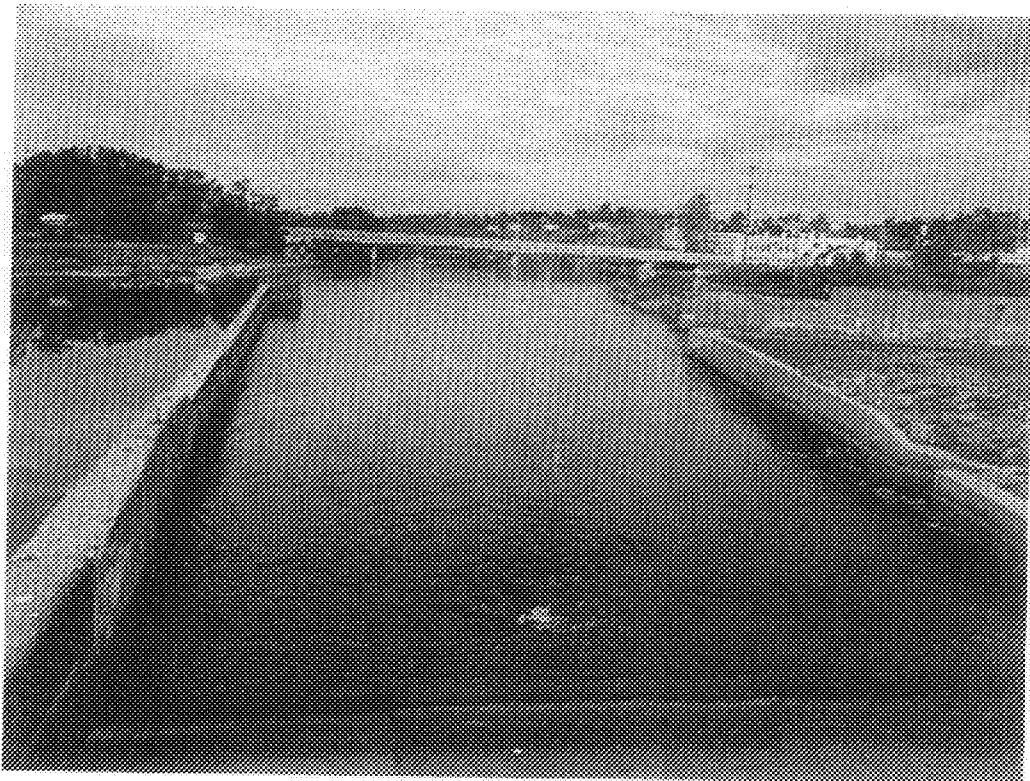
View of tailrace area downstream of the new powerhouse where warning sign was formerly located.
